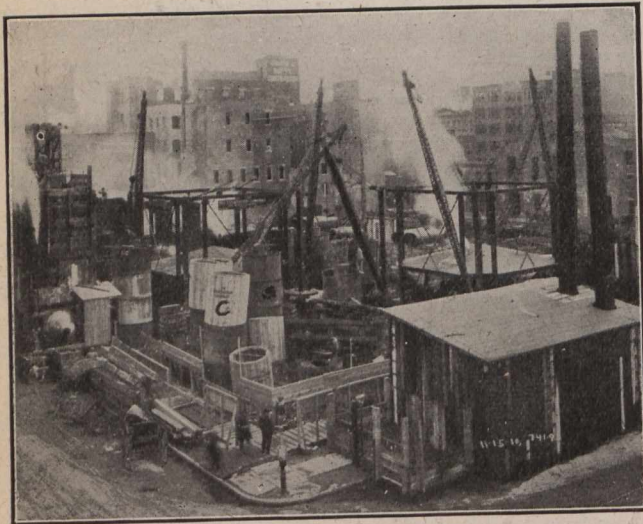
Showing operation on November 15, 1910, also concrete mixer. "S" steel "Form" or shell removed before sinking. "C" Wooden Cofferdam.
